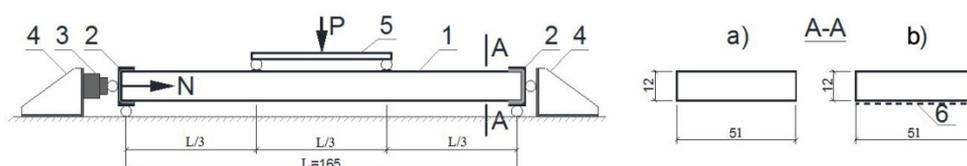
Scheme of tests of unreinforced (a) and reinforced (b) masonry compression specimens with bending (dimensions in cm)
